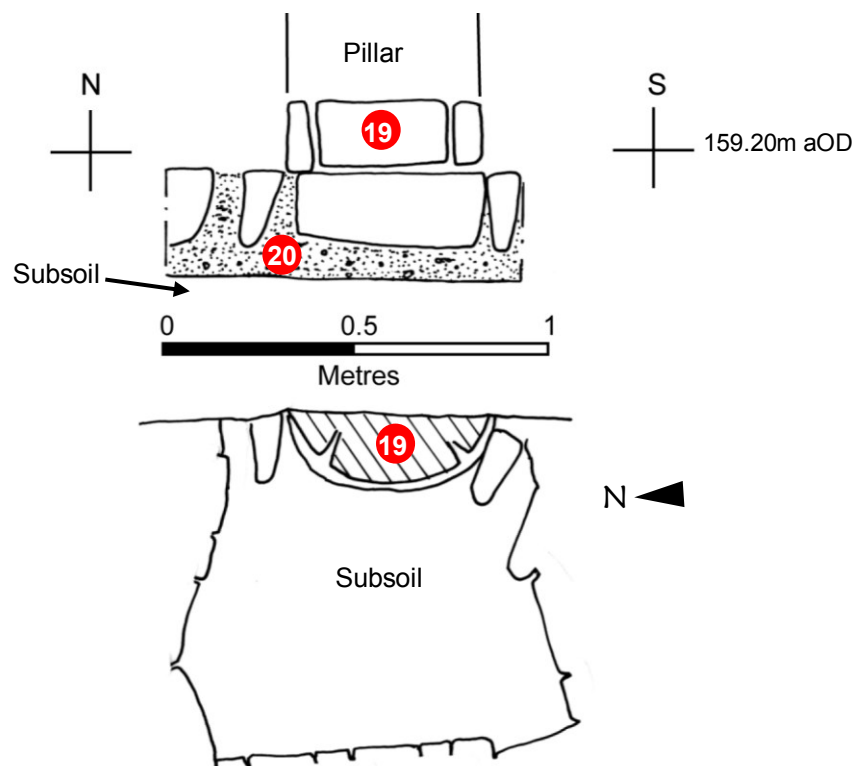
Test Pit 5. West facing section and plan. 1:20 scale.
